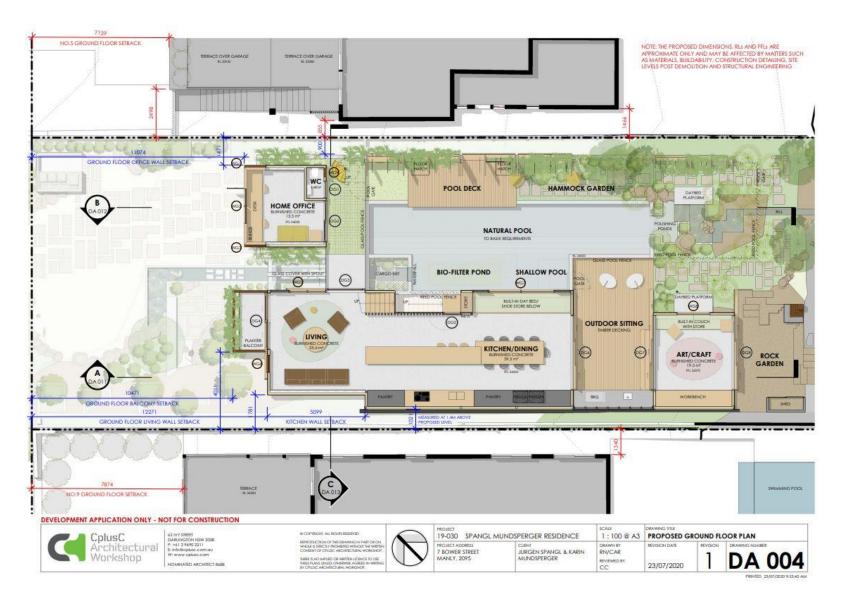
Ground Floor plan of proposed new dwelling house at 7 Bower Street, Manly (see final architectural plans from CplusC Architectural Workshop Revision 1)
